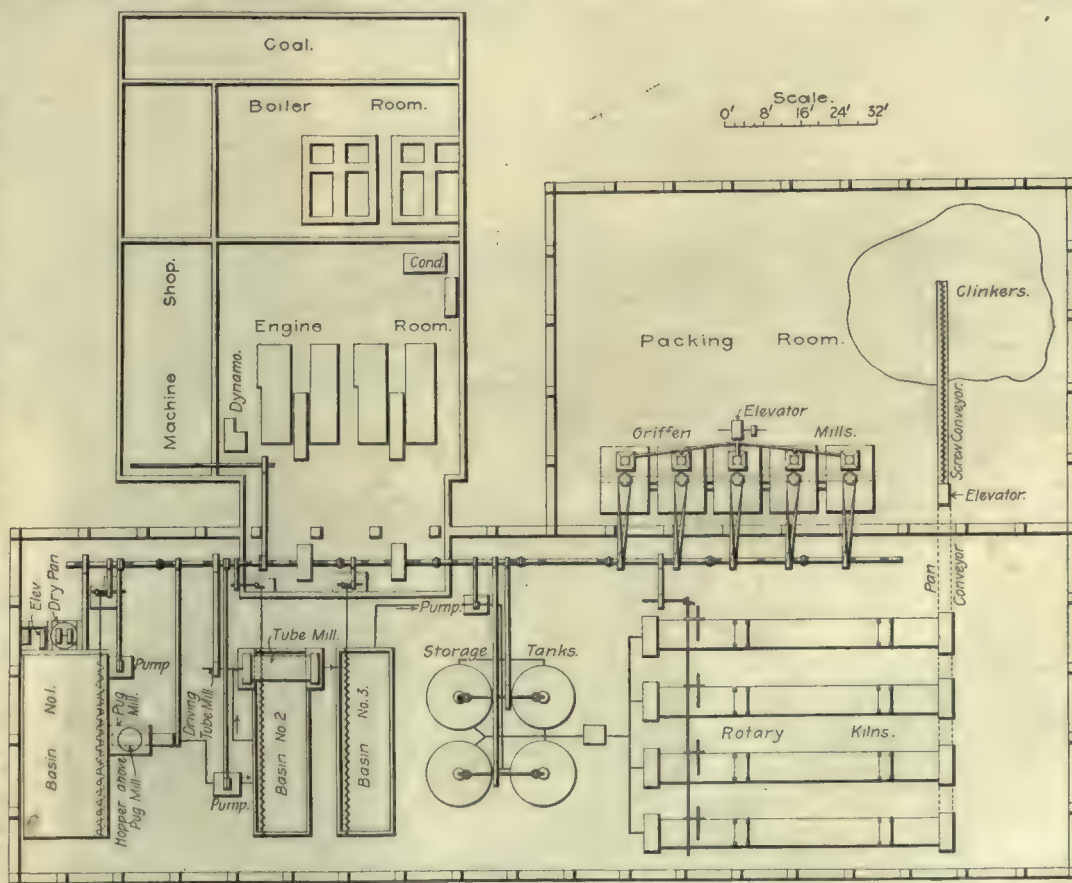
PLAN OF MICHIGAN PORTLAND CEMENT COMPANY'S WORKS.
